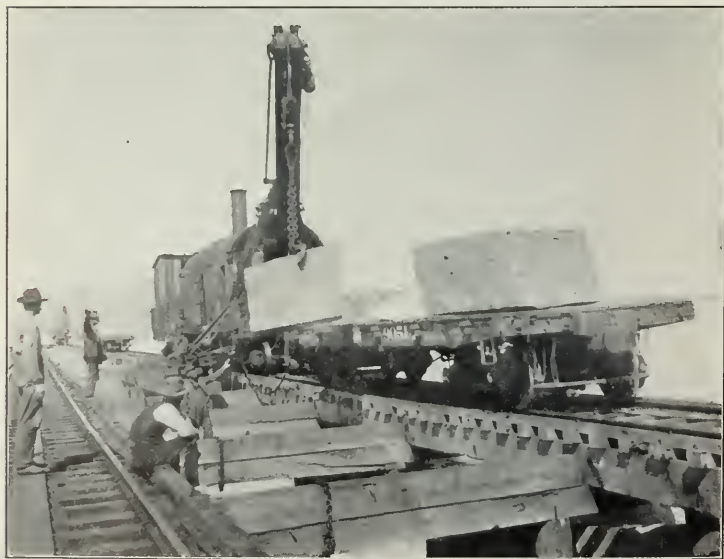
TWO STONES FOR OCEAN WALL OF SUPERSTRUCTURE OF SAN PEDRO
